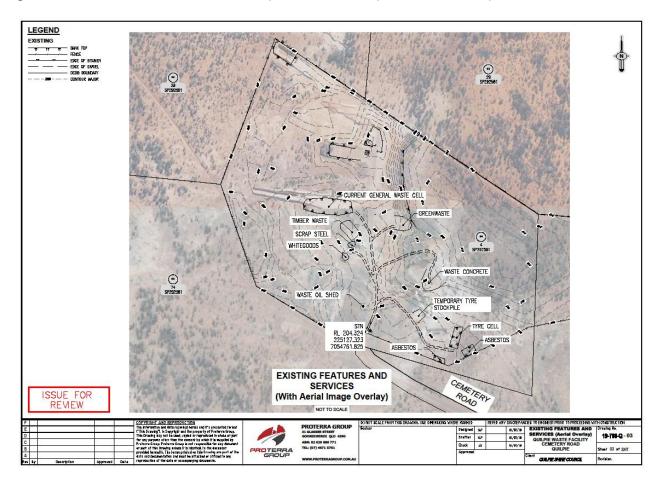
Existing Site Plan - Quilpie Waste Facility
